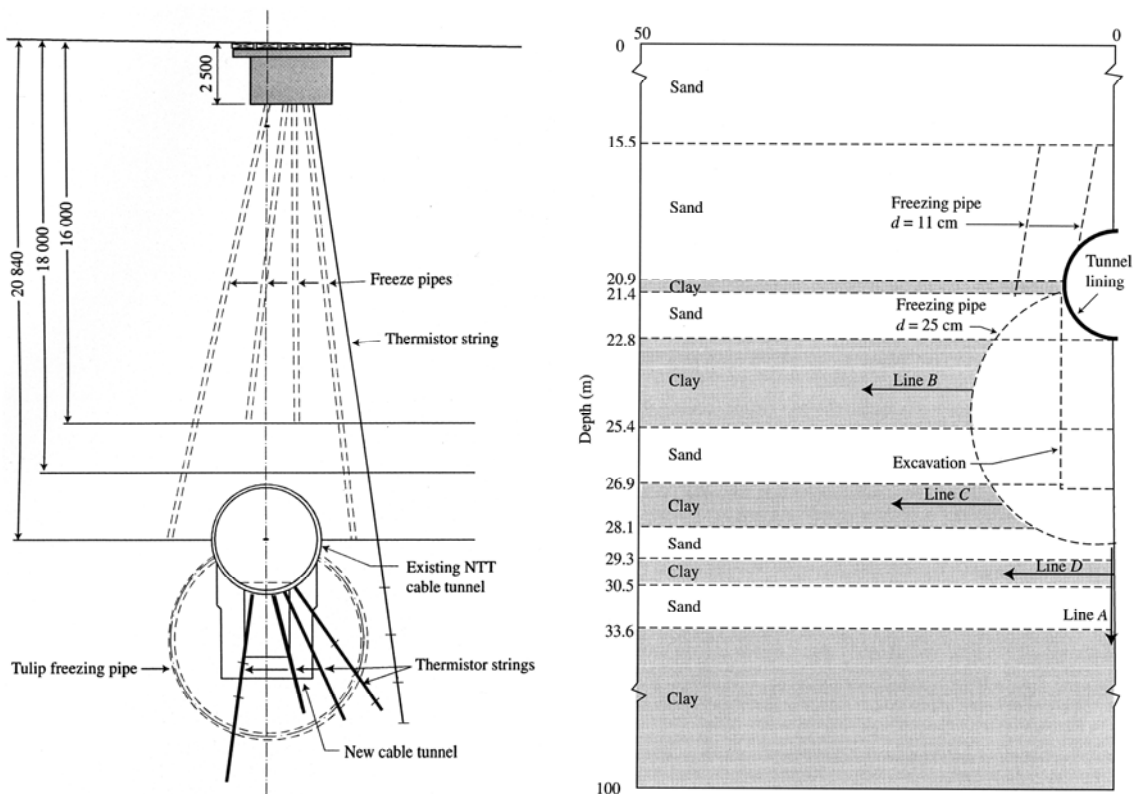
On the left-hand side; Cross section; freezing around existing tunnel. At the 'tunnel crossing' between the existing cable tunnel (NTT) and the subway's lower tunnel pipe was connected to the NTT tunnel via the building of a new short tunnel (the rectangular) under the subway, after Konrad (2002). On the right-hand side; cross section showing the geology for the frozen tunnel, after Konrad (2002)
